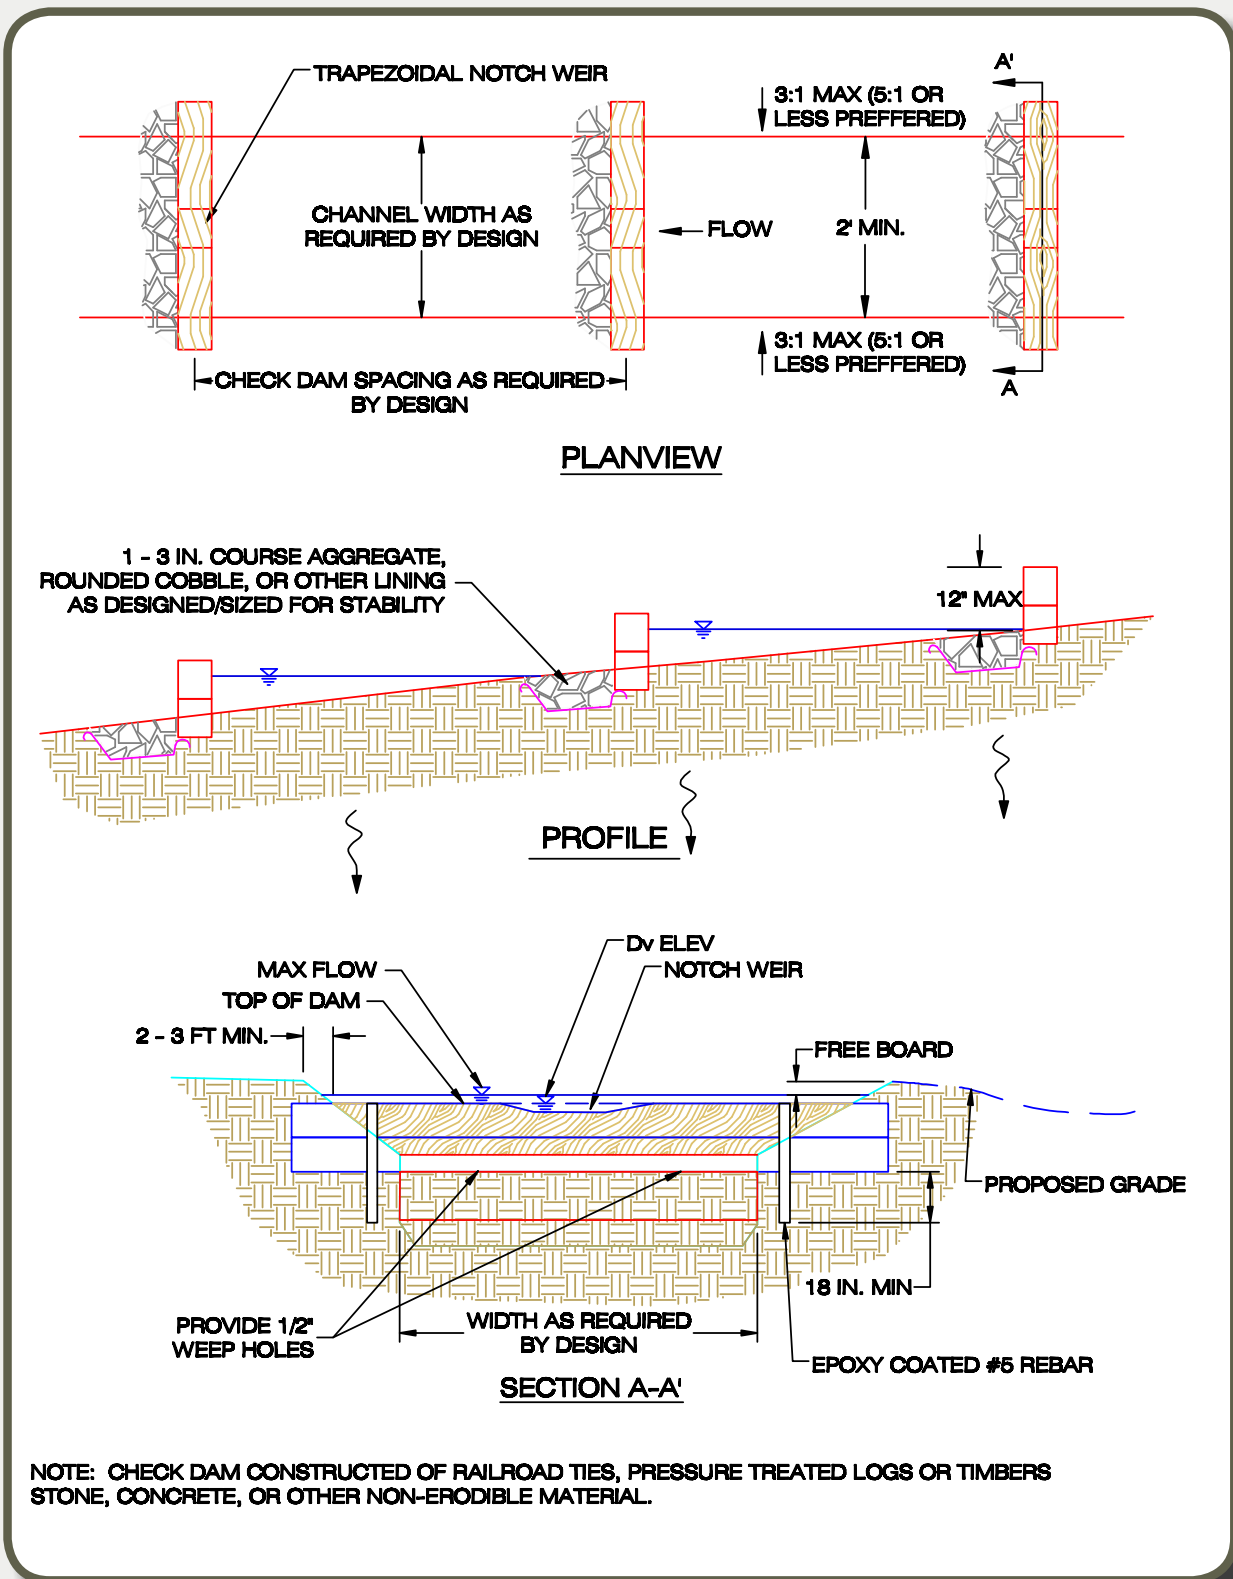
Typical Detail for Grass Swale with Check Dams
